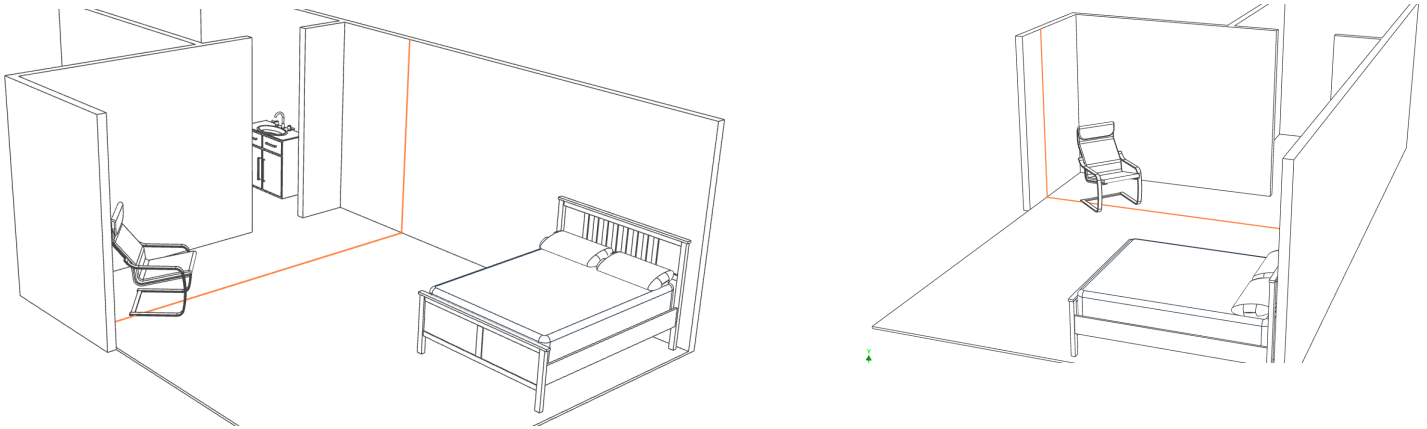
A Laser Line Projects Where the Track Will be Placed from Wall to Wall
